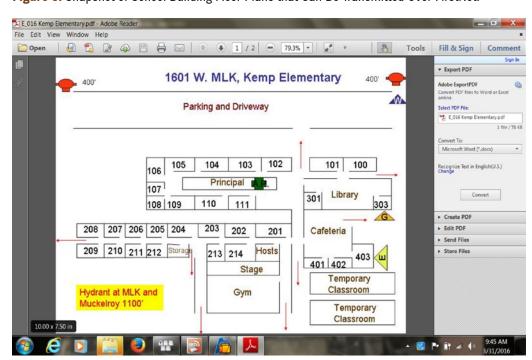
Snapshot of School Building Floor Plans that Can Be Transmitted Over FirstNet.
